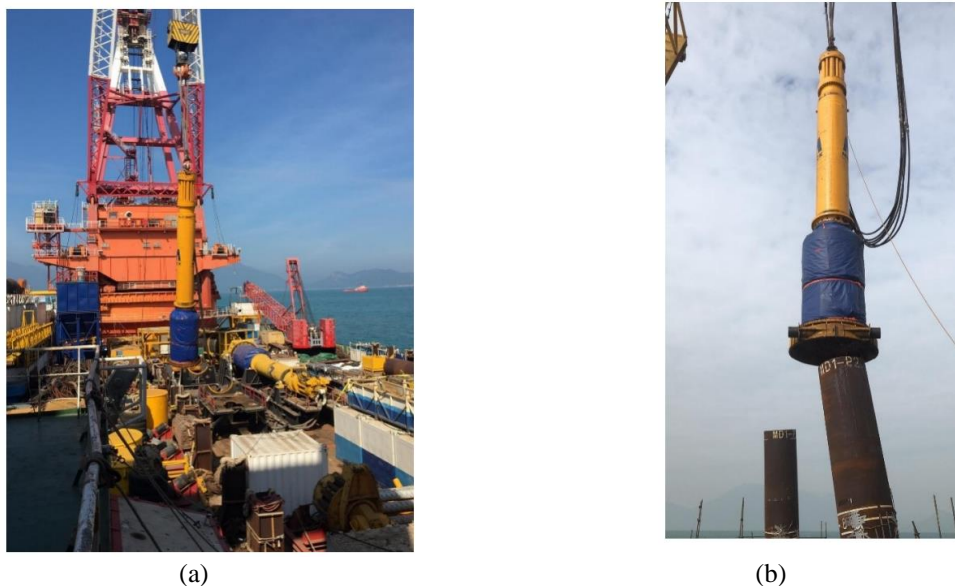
Difficulties of installation caused by weather (a) heavy piling hammer needs to be lifted from congested deck and (b) difficulty to slot piling hammer into raking piles.
